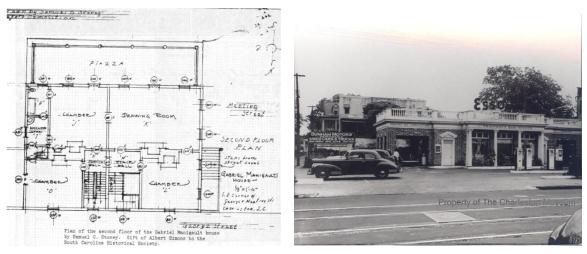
The second floor of the Manigault house. Courtesy of the Historic Charleston Foundation.
